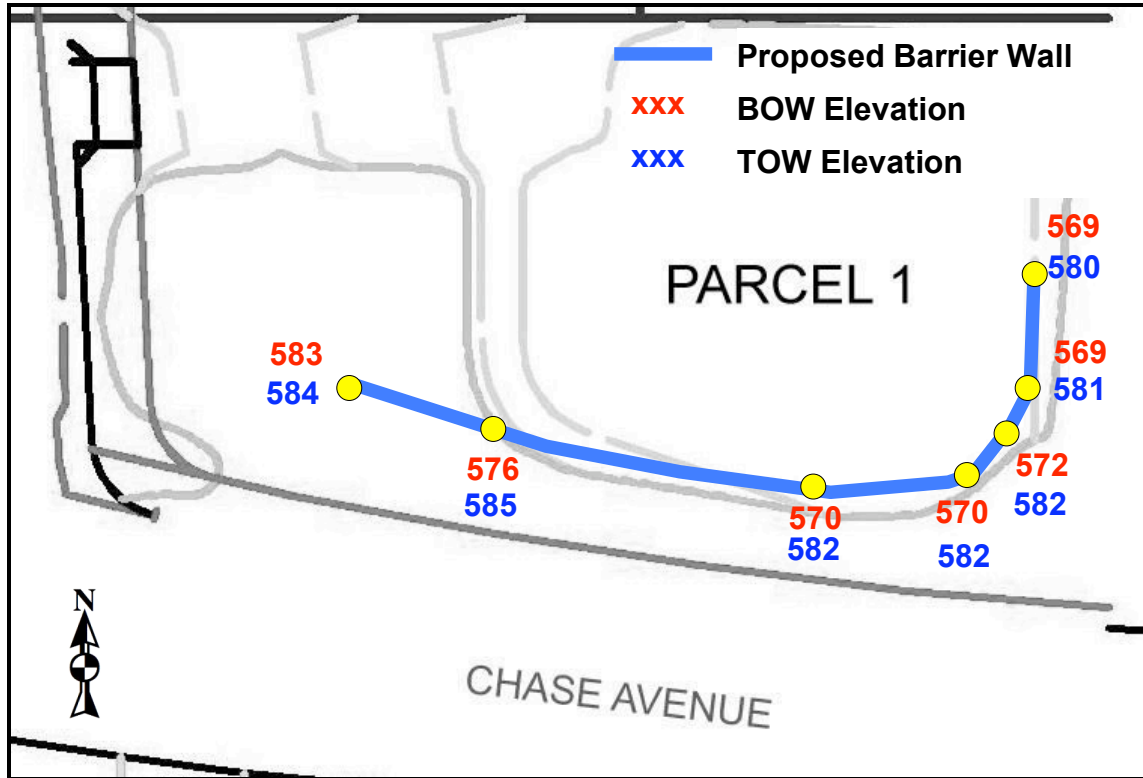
Proposed Noise Barrier Wall and Wall Elevation (ISE, 3/06)
